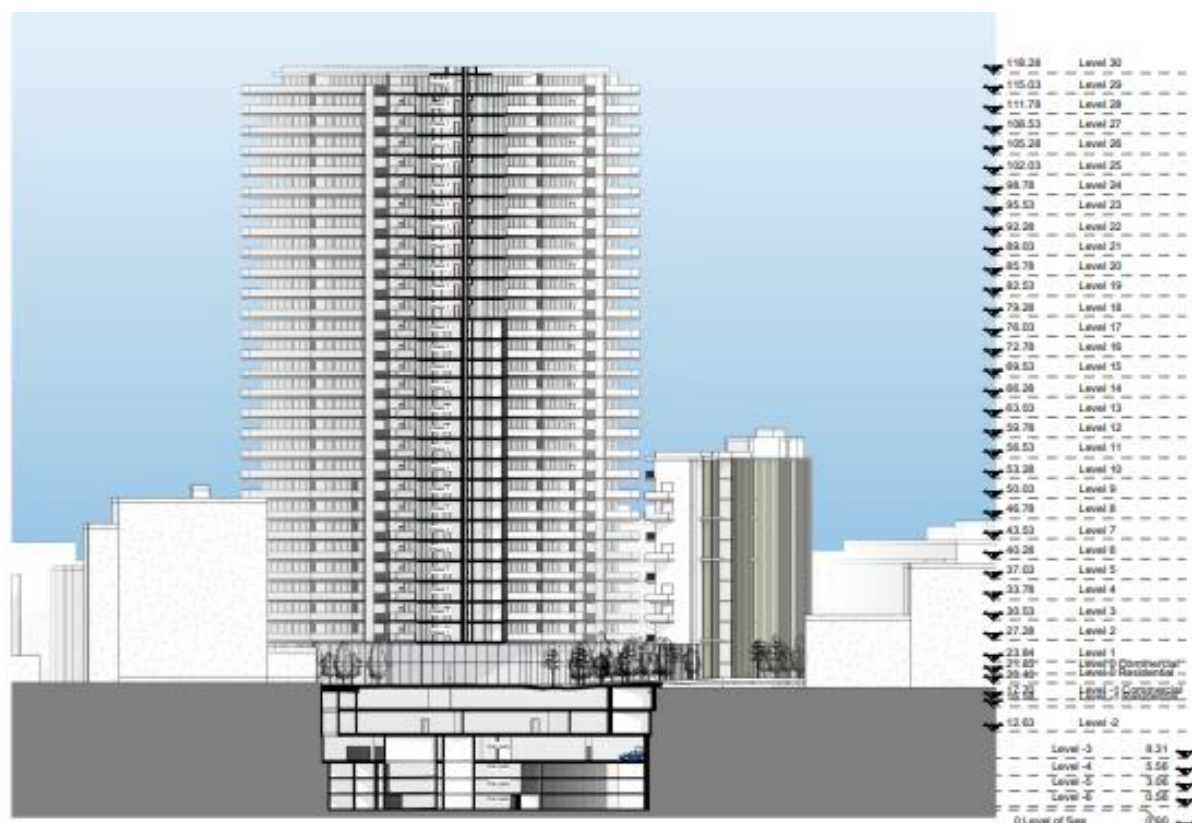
Section drawing of the proposed development, showing the proposed hotel building adjacent (right side) to the residential tower (Source: EIA Coordinator Statement, August 2023, <https://era.org.mt/era-project/pa01191-05/>).
